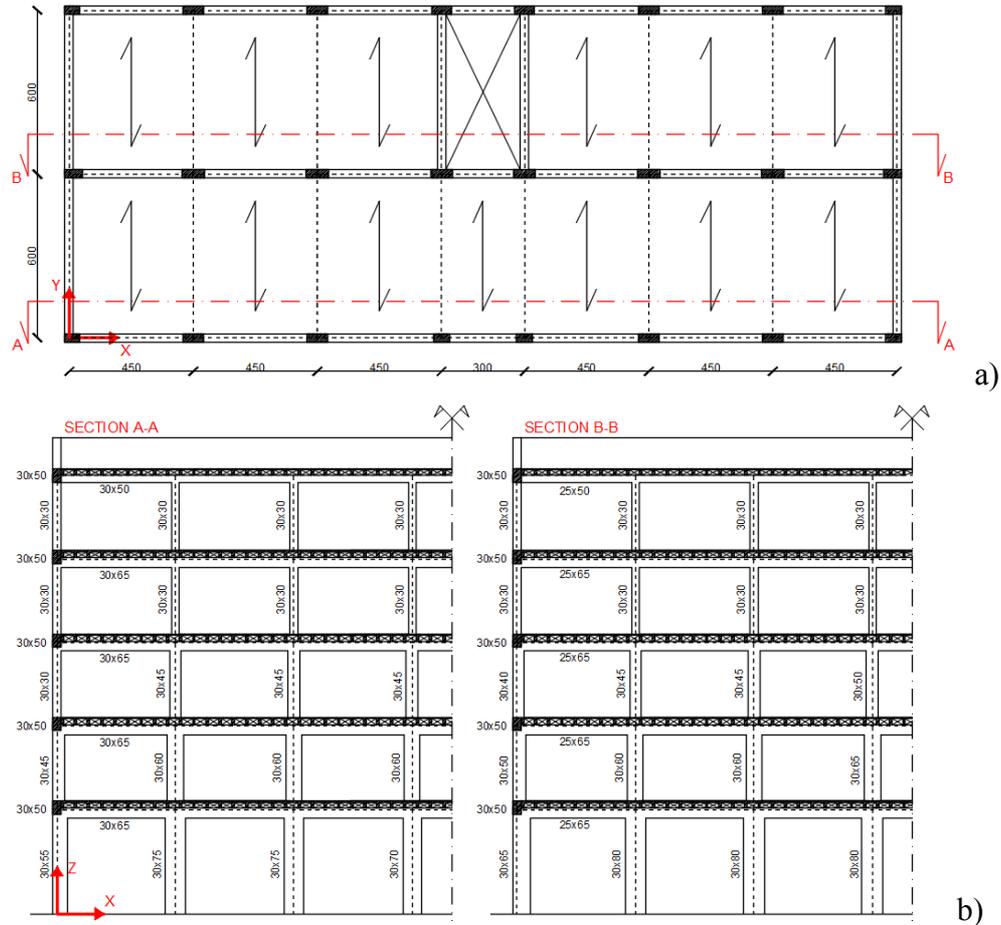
Existing building under investigation: typical plan layout (a) and vertical sections (b)
